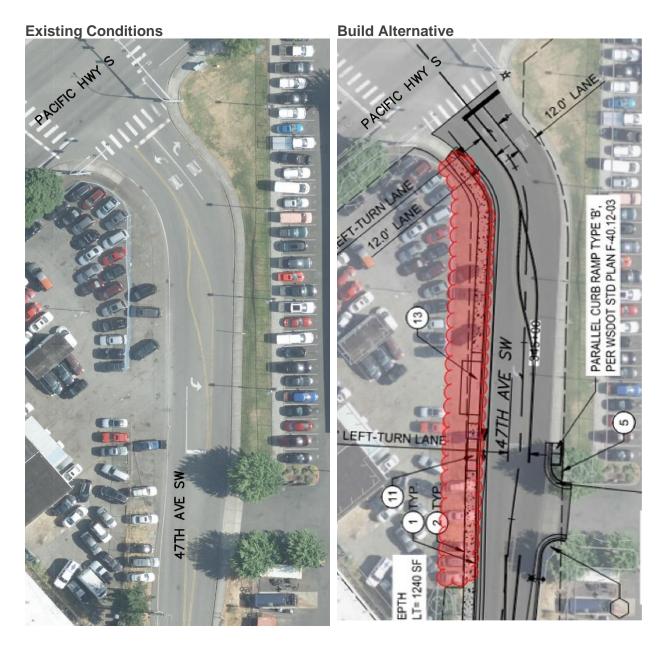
Parking – 47th Avenue SW between Pacific Highway S and I-5 Bridge
